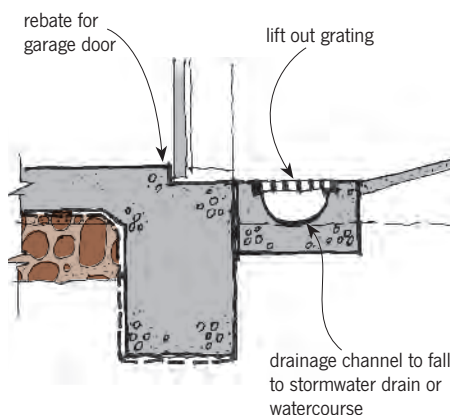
Garage entrance with step down approach. (Reinforcing not shown)
